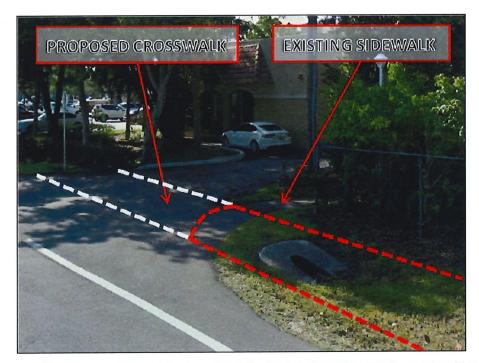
91st Avenue N and Rear Entrance at 9051 Tamiami Trail N Sidewalk Alignment and Crosswalk
